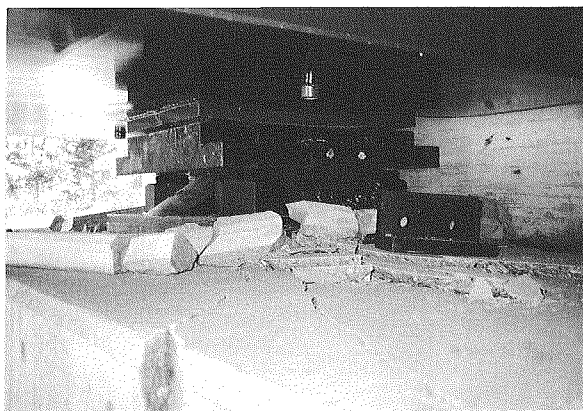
Damaged shoe and anchorage of pier of Rindo-Ohashi bridge
